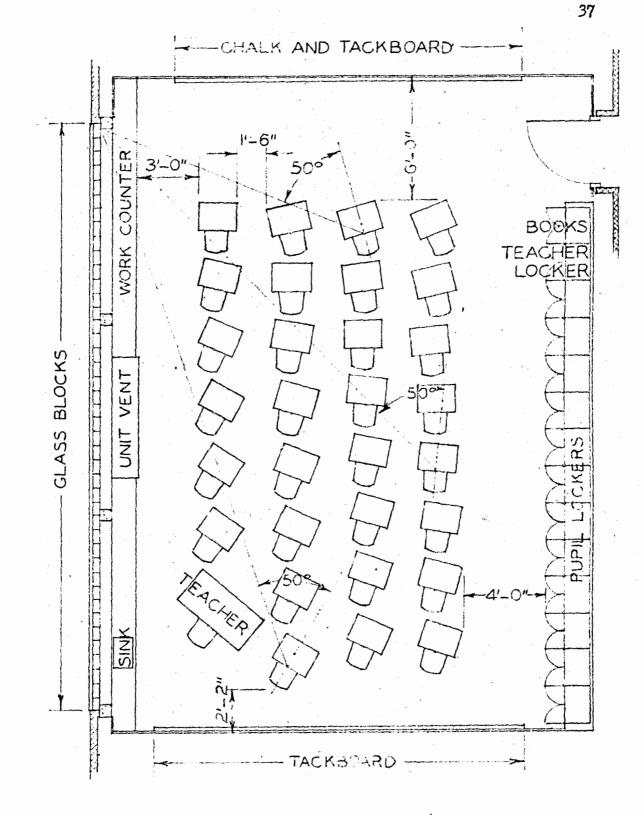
FIG. I. PLAN OF TYPICAL CLASSROOM GEORGE MASON SCHOOL ADDITION RICHMOND, VIRGINIA
